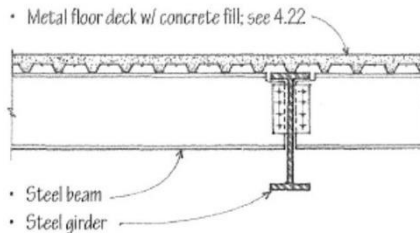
STRUCTURE SYSTEM DETAIL B
